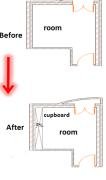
Installing a cupboard. (Source: Authors, 2023)
